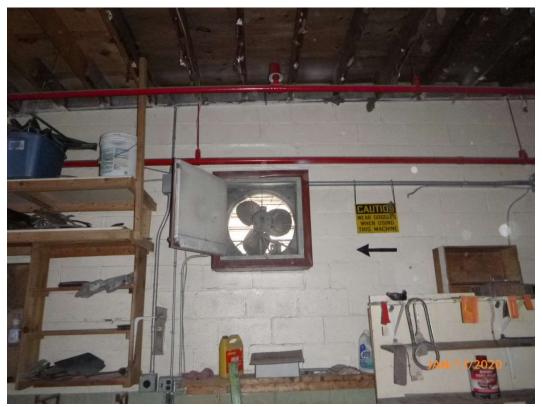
Exhaust fan for the shop, located along the east wall of the building.
